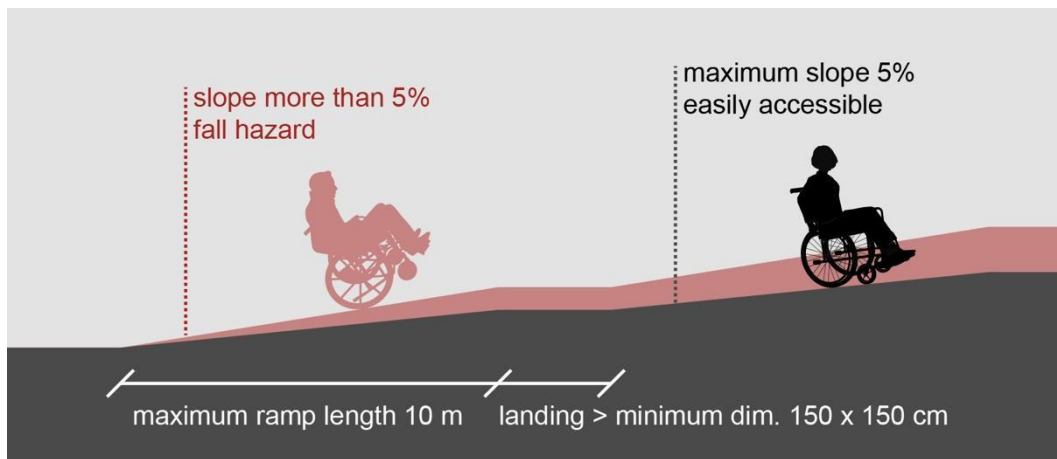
Section diagram illustrating the recommended maximum longitudinal slope of 5%, which does not pose significant hazard risks, and a ramp length of 10 m between two landings with minimum dimensions of 150 × 150 cm. (Authors' work)
